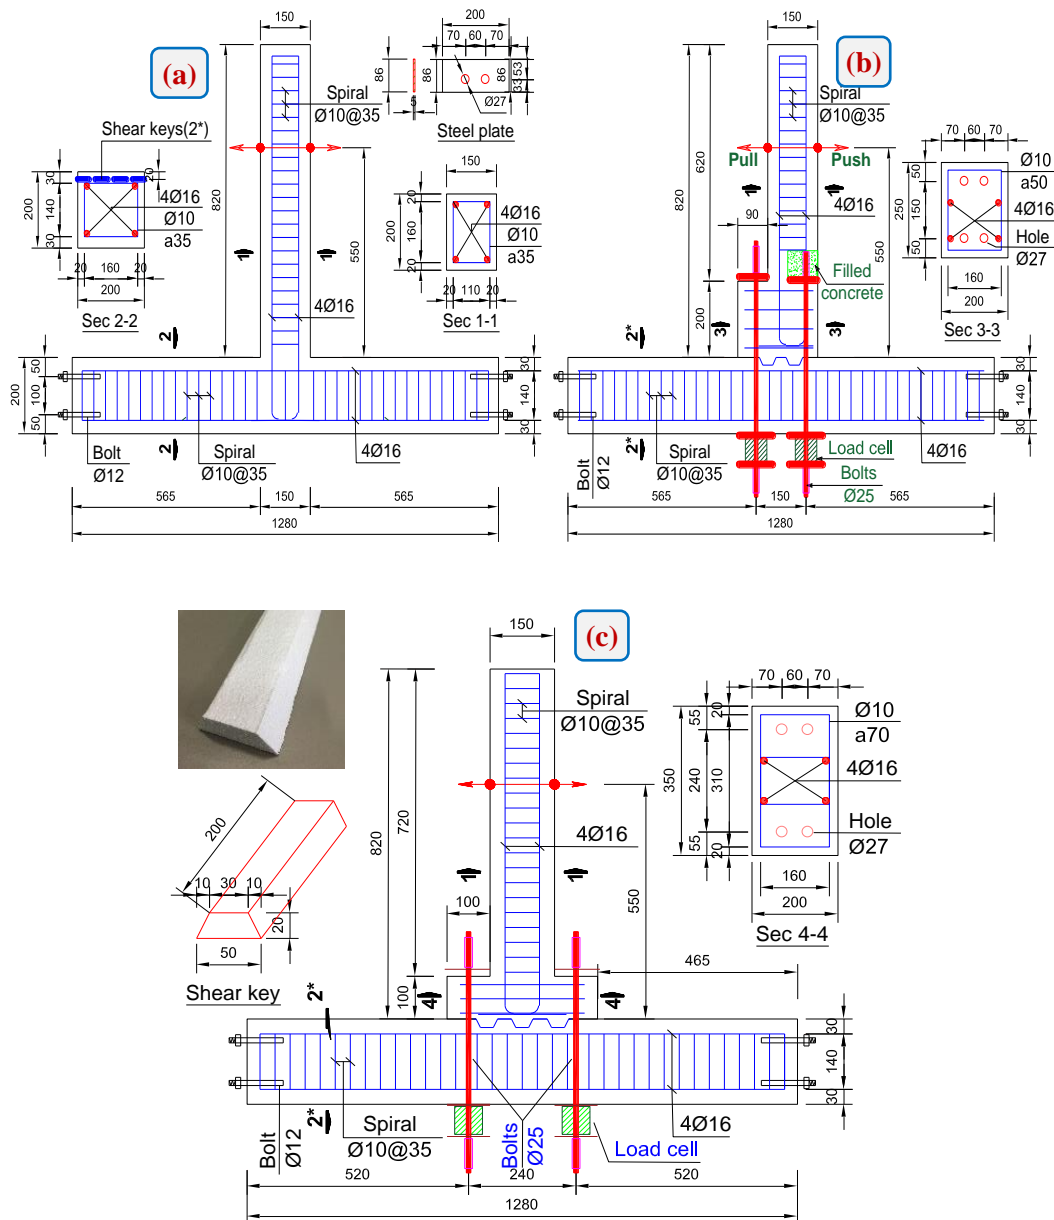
Dimensions of the monolithic joint (a), hybrid joint (b), and dry joint (c) (unit: mm).
